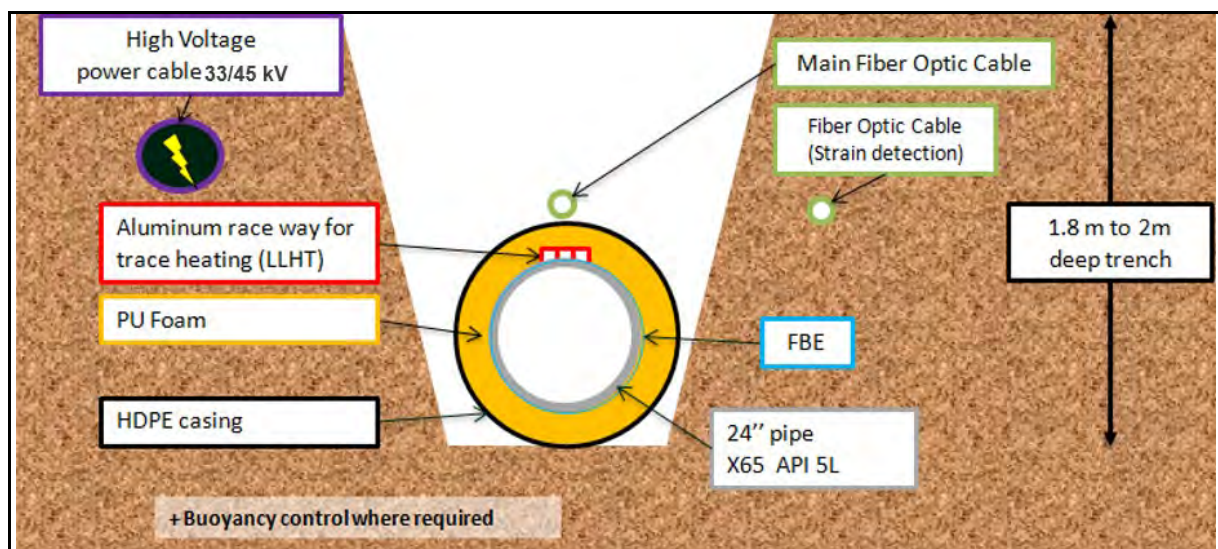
Typical Feeder Pipeline Cross-Section
